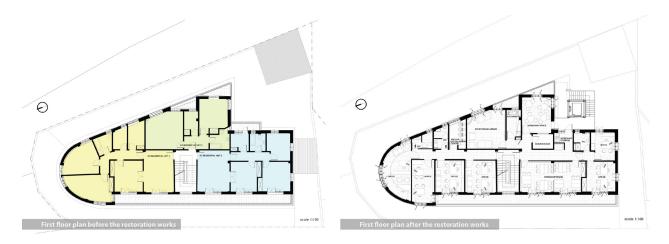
First Floor Plan, before and after the restoration works (Drawings courtesy of studio3 architects and etikastudio).
